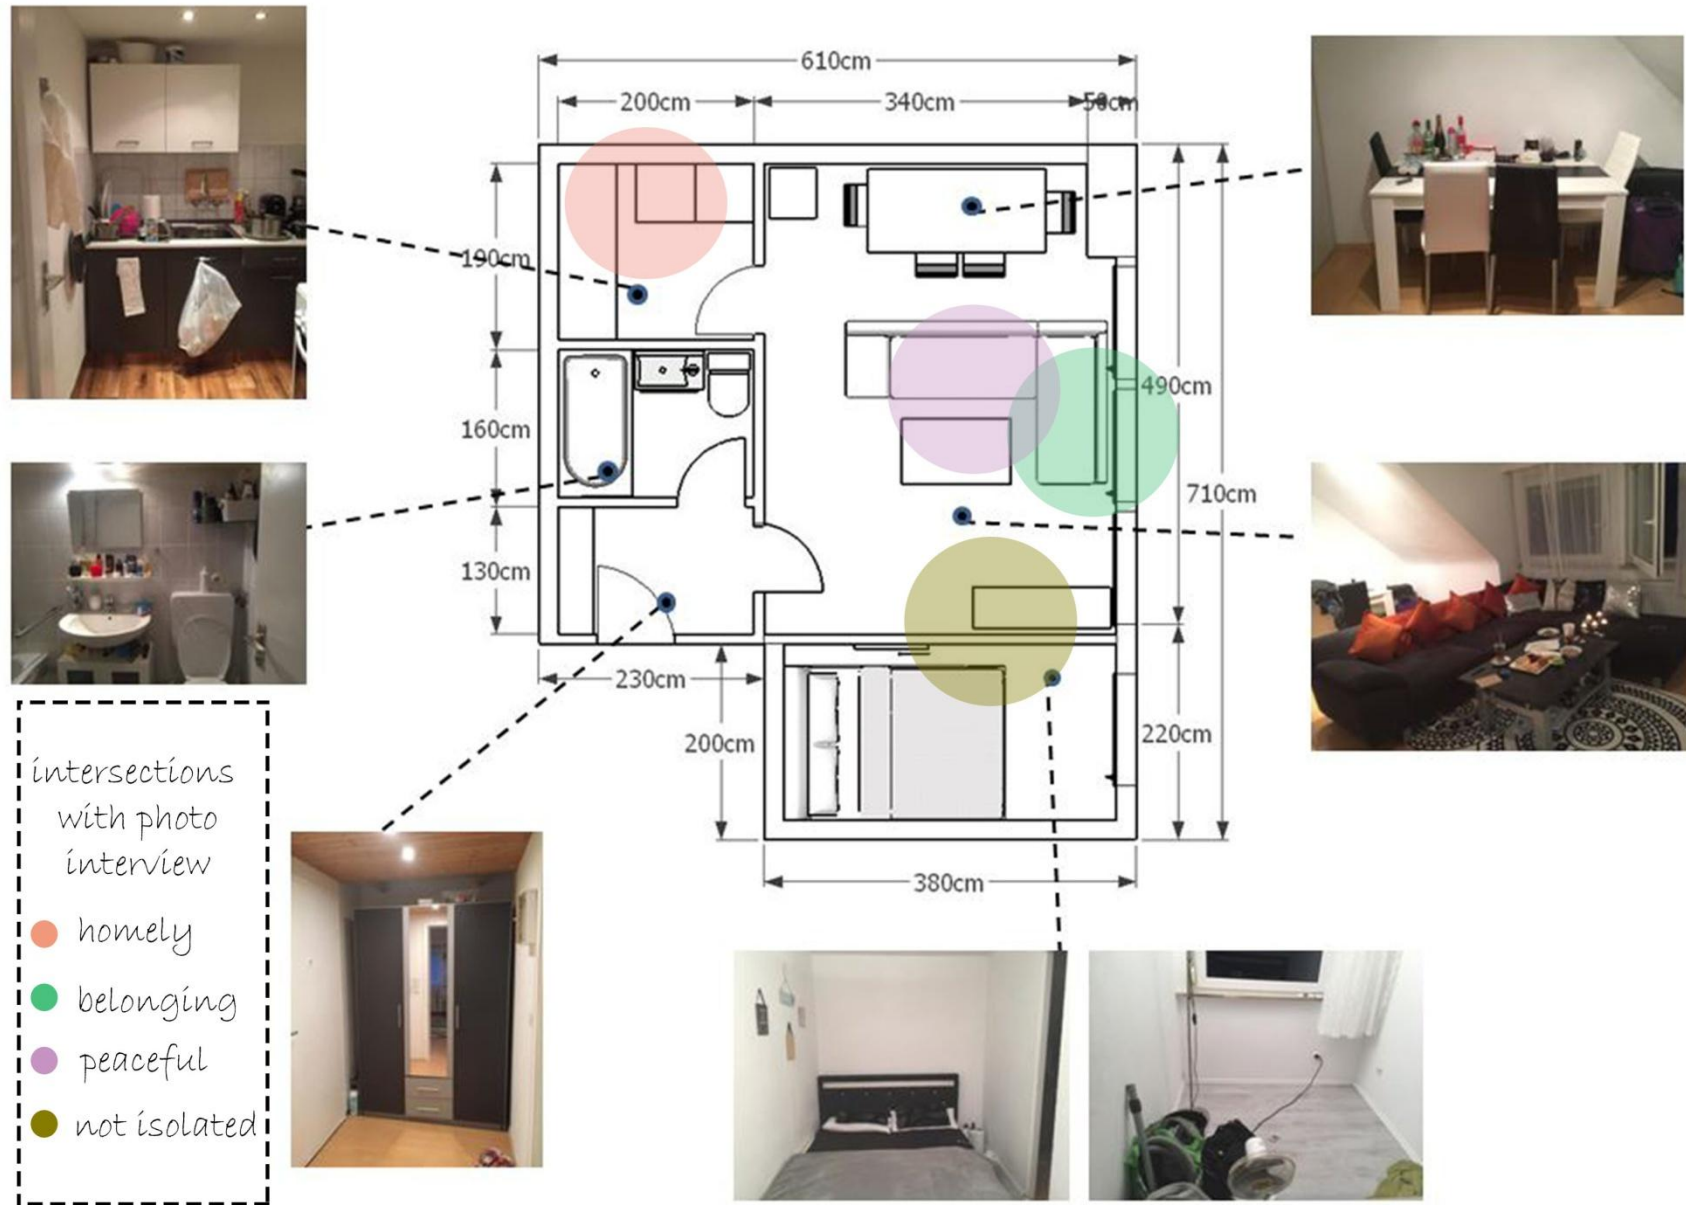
Plan and Photos of Ali Raza's flat.
